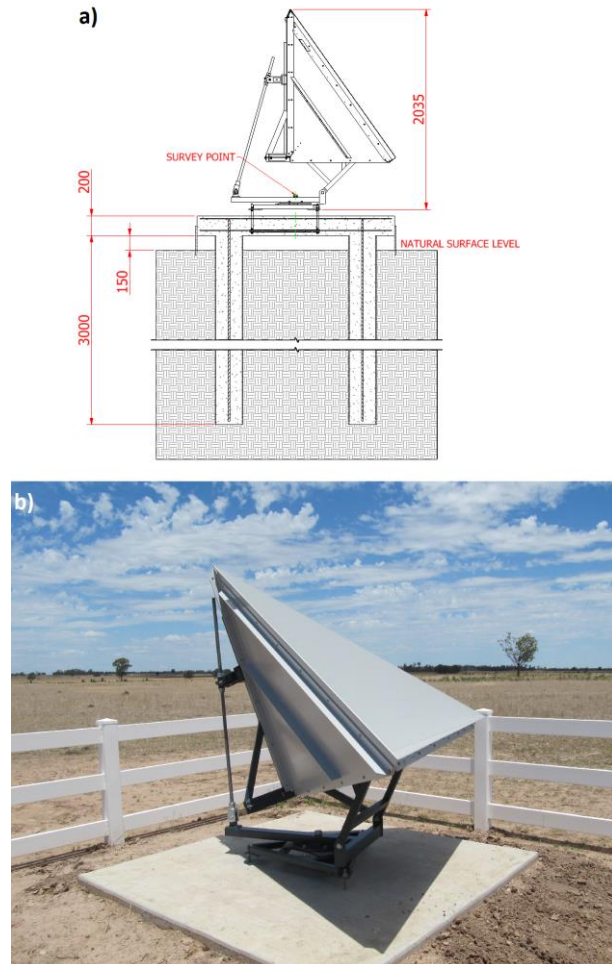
a) Engineering drawing of the 1.5 m triangular trihedral corner reflector (side-on view) and concrete foundation design. Dimensions in mm. b) 1.5 m corner reflector installed at Site 26. Concrete slab dimension is 2.0 m square. Most sites have a plastic fence to protect the corner reflector from livestock damage.
